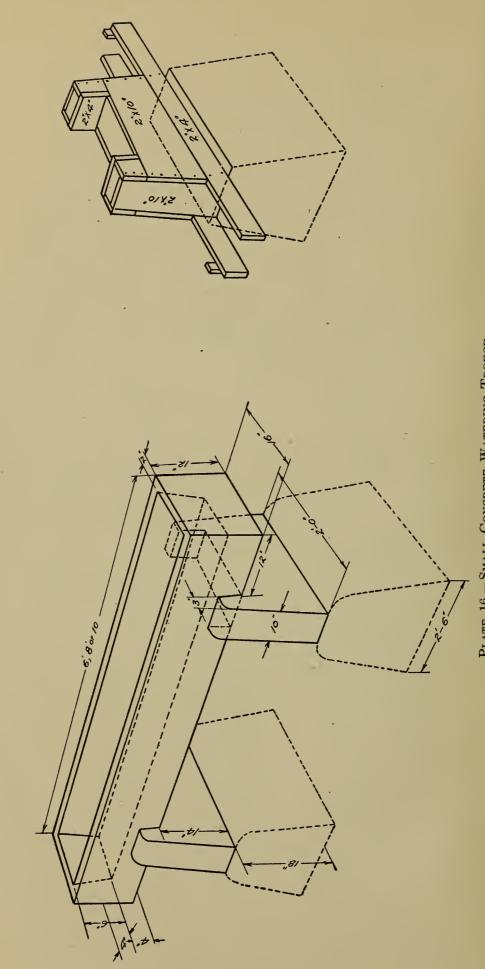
SMALL CONCRETE WATERING TROUGH.
